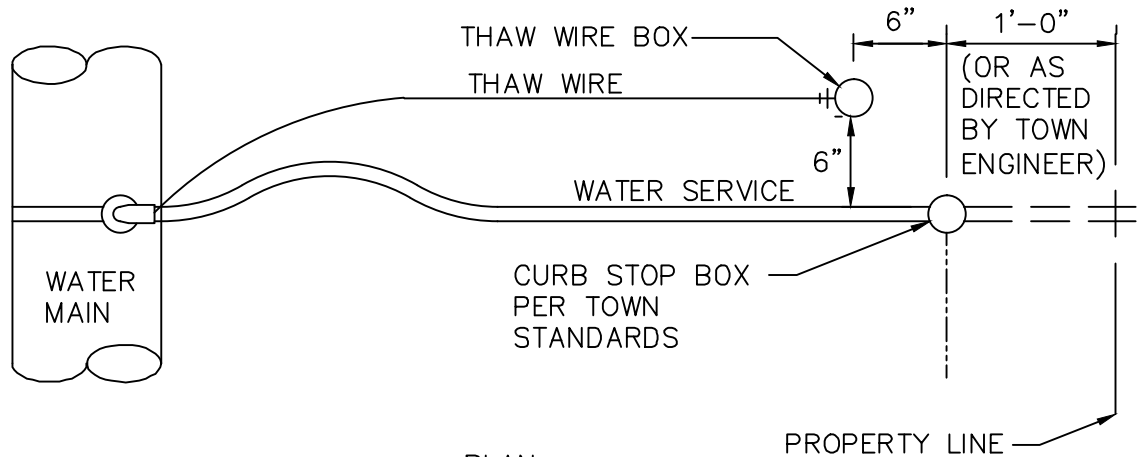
DETAIL OF A PROPERLY INSTALLED CORPORATION STOP, SHOWING GOOSENECK IN SERVICE PIPE.
